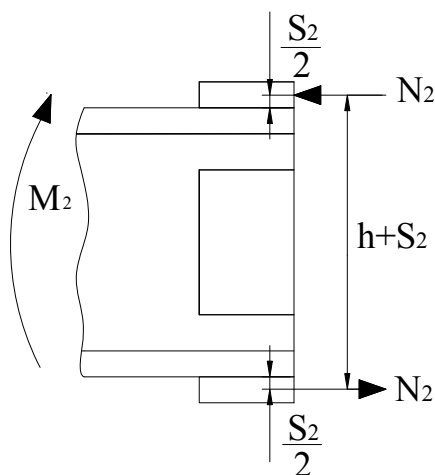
Stress on the welded joint fillet of the top and bottom plates.
